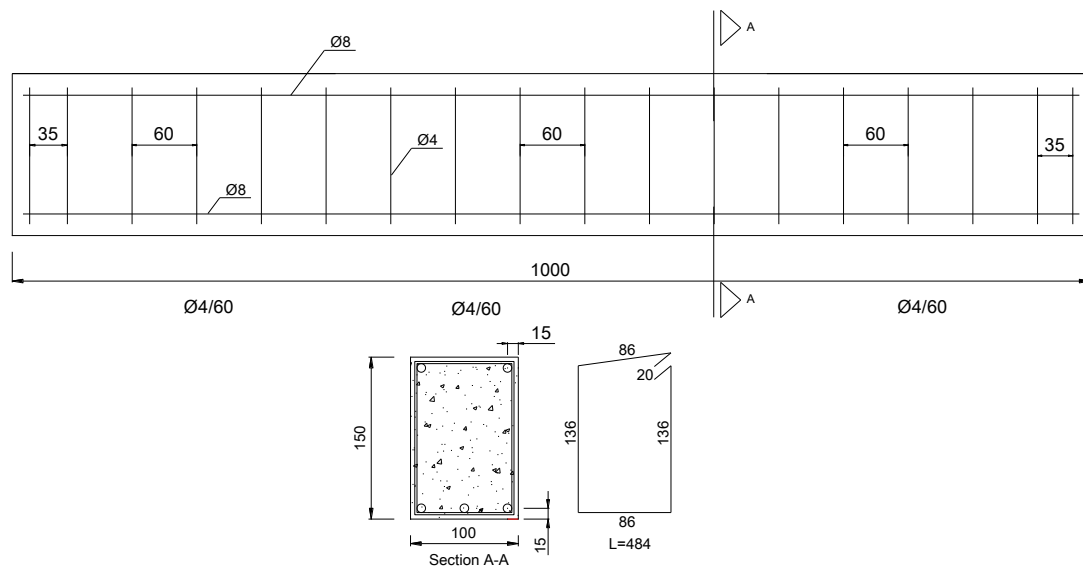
Reinforcement dimension and configuration of the tested RC beams.
